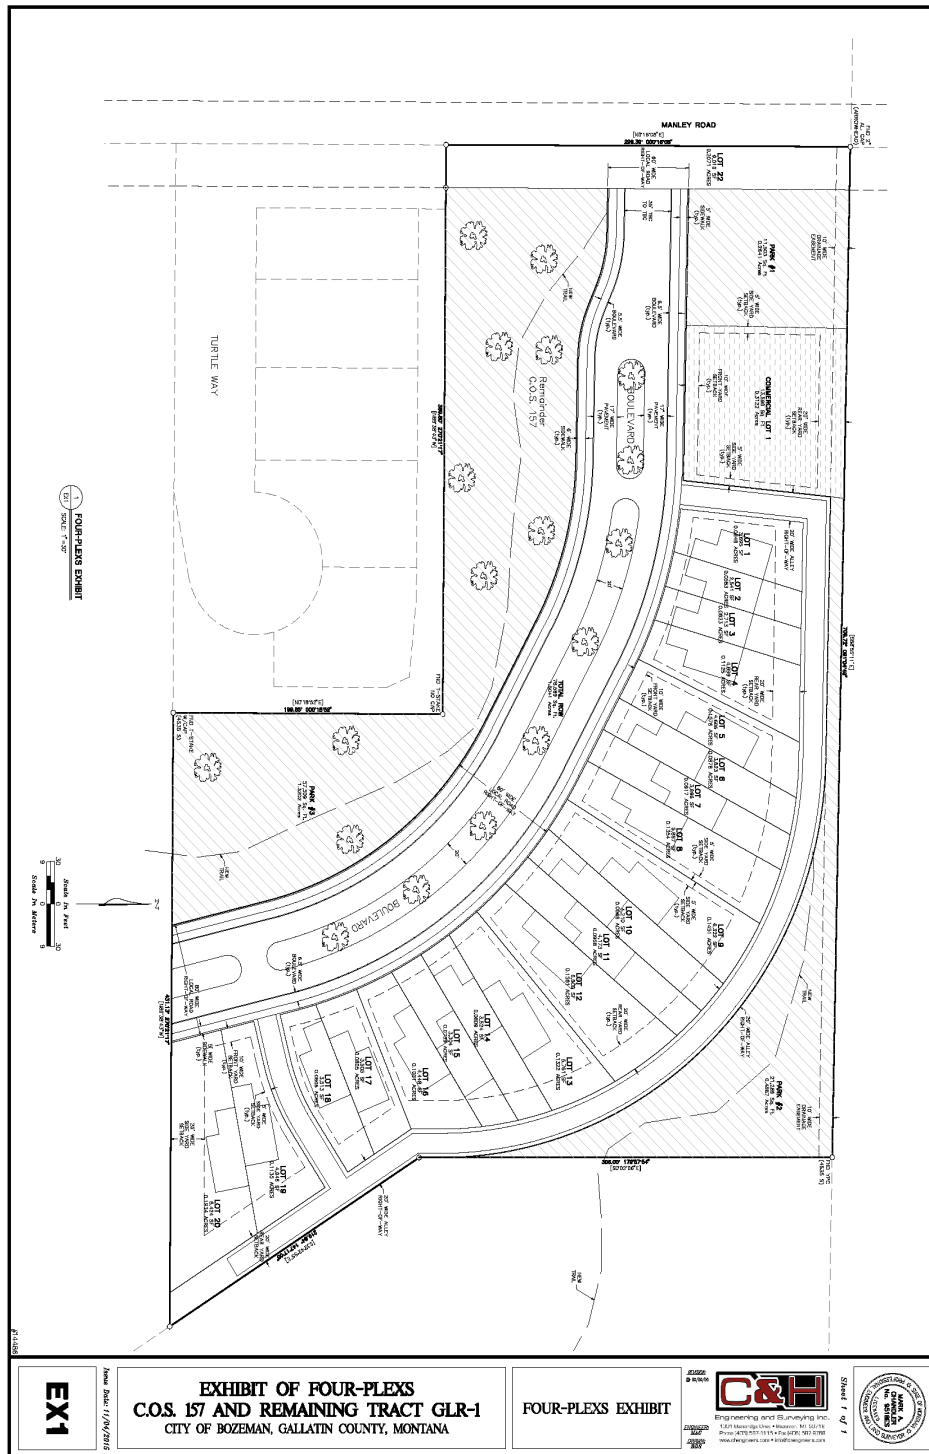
Proposed Commercial/Residential Development and new EGRA Park Entrance
